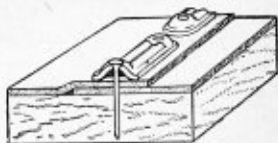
If one or two nails do strike a crack or poor spot in the roofing boards, no harm is done, for there will still be two other nails holding the cleat and roofing securely.
